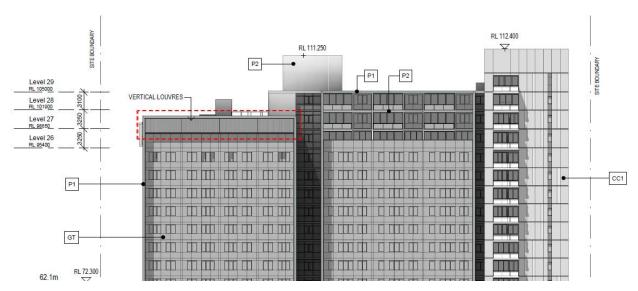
Eastern elevation of the building showing the location of the proposed louvres in red
